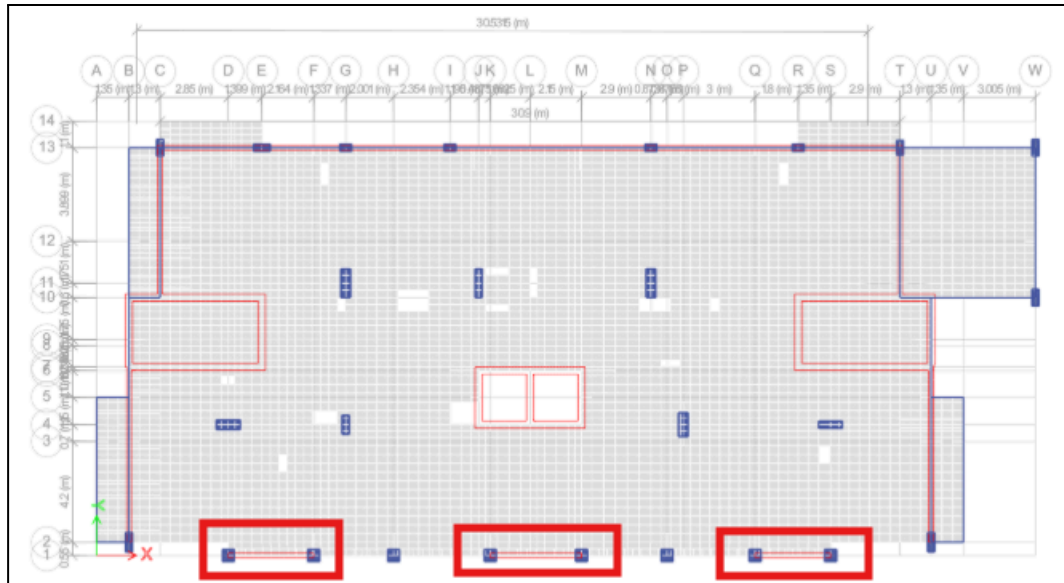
Plan view of ground floor, preliminary adjustment of walls distribution
